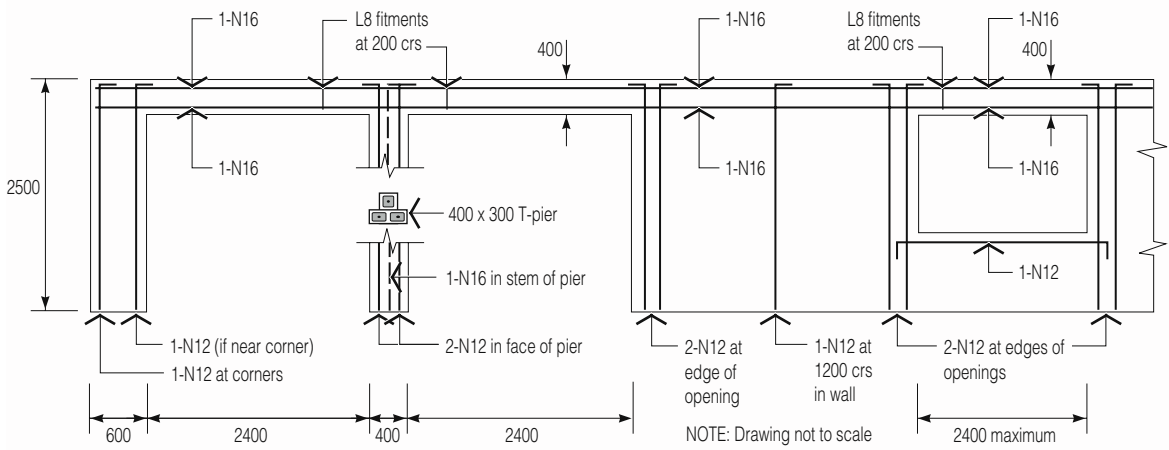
Wall Reinforcement for 140-mm Leaf for Wind Classifications N5 and C2 and 2500-mm Wall Height
